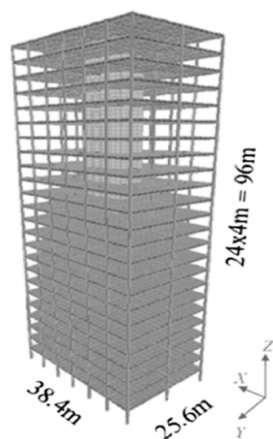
24-storey building with steel or RC frame and RC shear-wall core.
